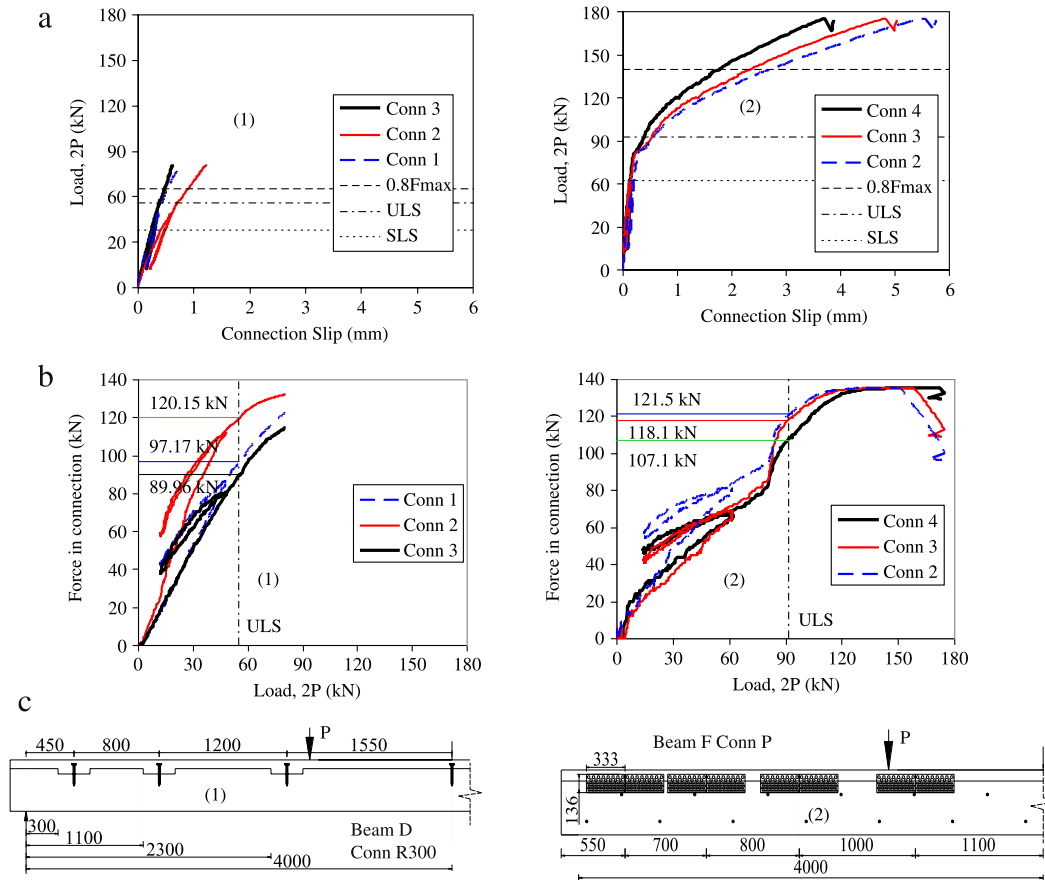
Load-connection-slip curves (a), the corresponding shear force in connection (b), and position of connectors with respect to loading point where Conn 1 is located nearest to left support and Conn 4 nearest to mid-span (c), for (1) beam D1 with single LVL (connection R300), and (2) beam F1 with double LVL (connection P). (Refer to Fig. 4 for connection type.)
